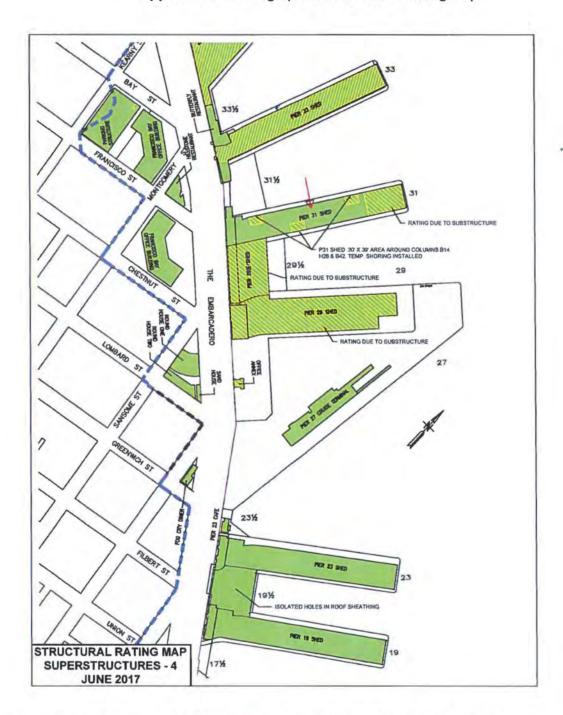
Superstructure rating map for Pier 31 shed. Three columns have temp, shoring and supported roof area is yellow tagged. Outer end of pier is yellow tagged due to substructure rating.
